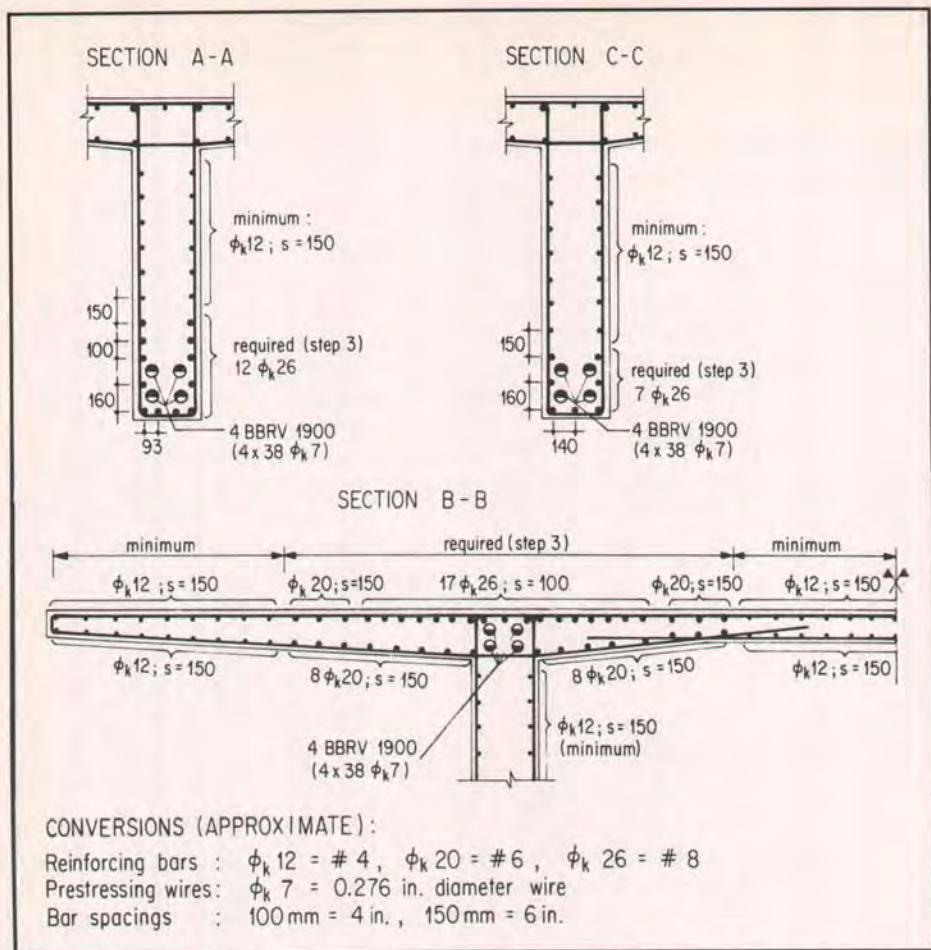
Design example: Details of prestressed and nonprestressed reinforcement.
